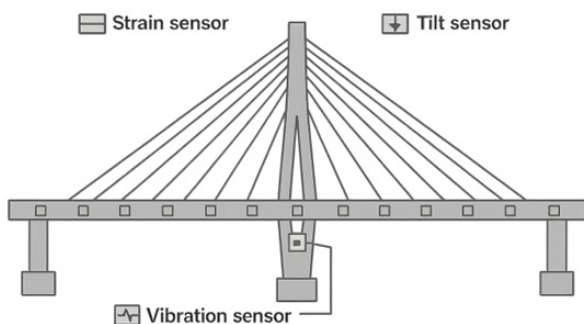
Sensor Placement Configuration Across the Bridge Structure
